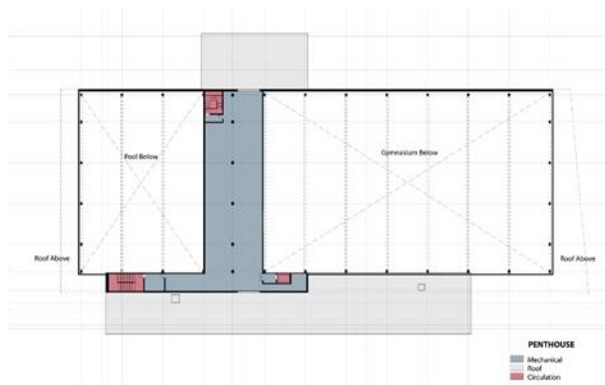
Penthouse Floor Plan (source: CannonDesign)
